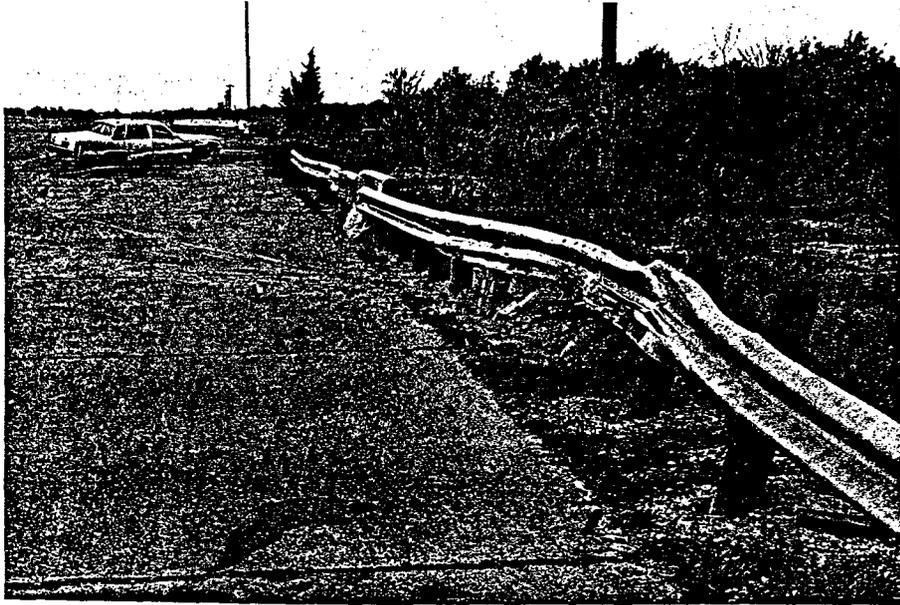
BARRIER DAMAGE AFTER TEST 3
